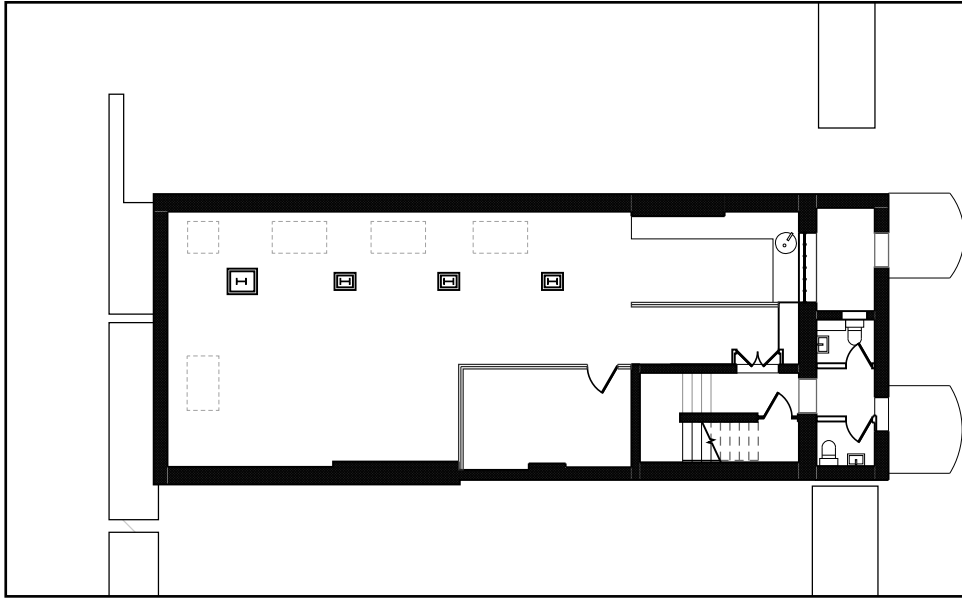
Second floor - Roof Skylights and Timber Fink Truss Roof
